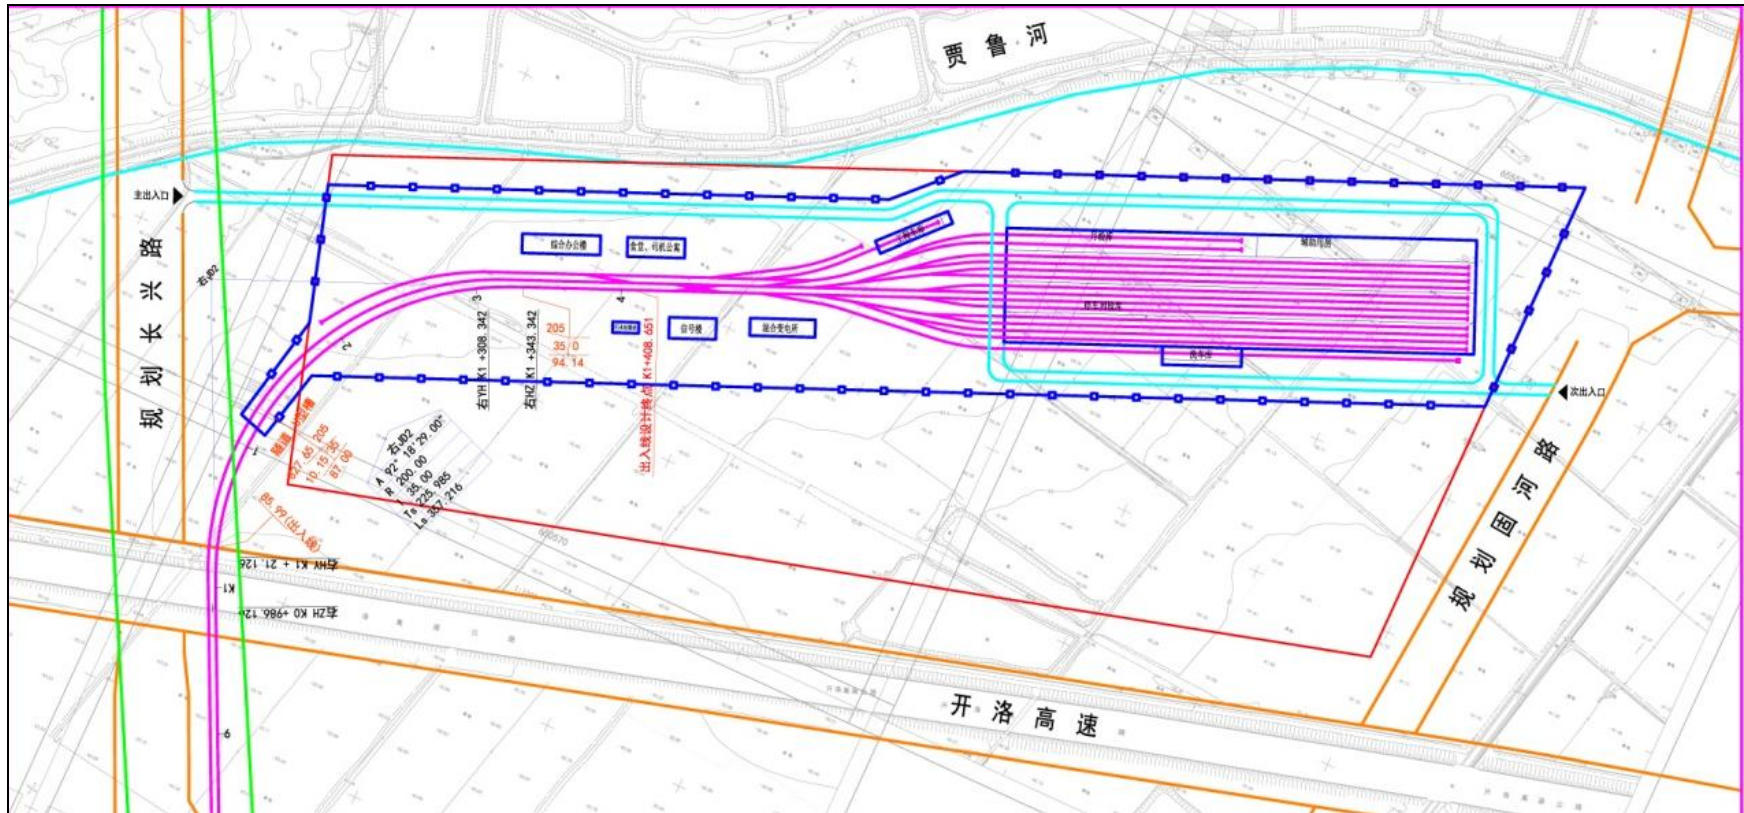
Layout Plan of Xinliu Road Parking Lot
